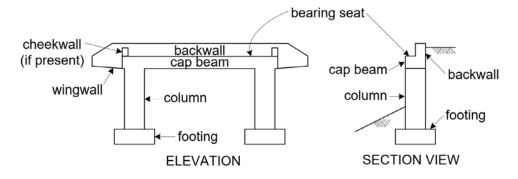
Sketch of Spill Through/Open Abutment
